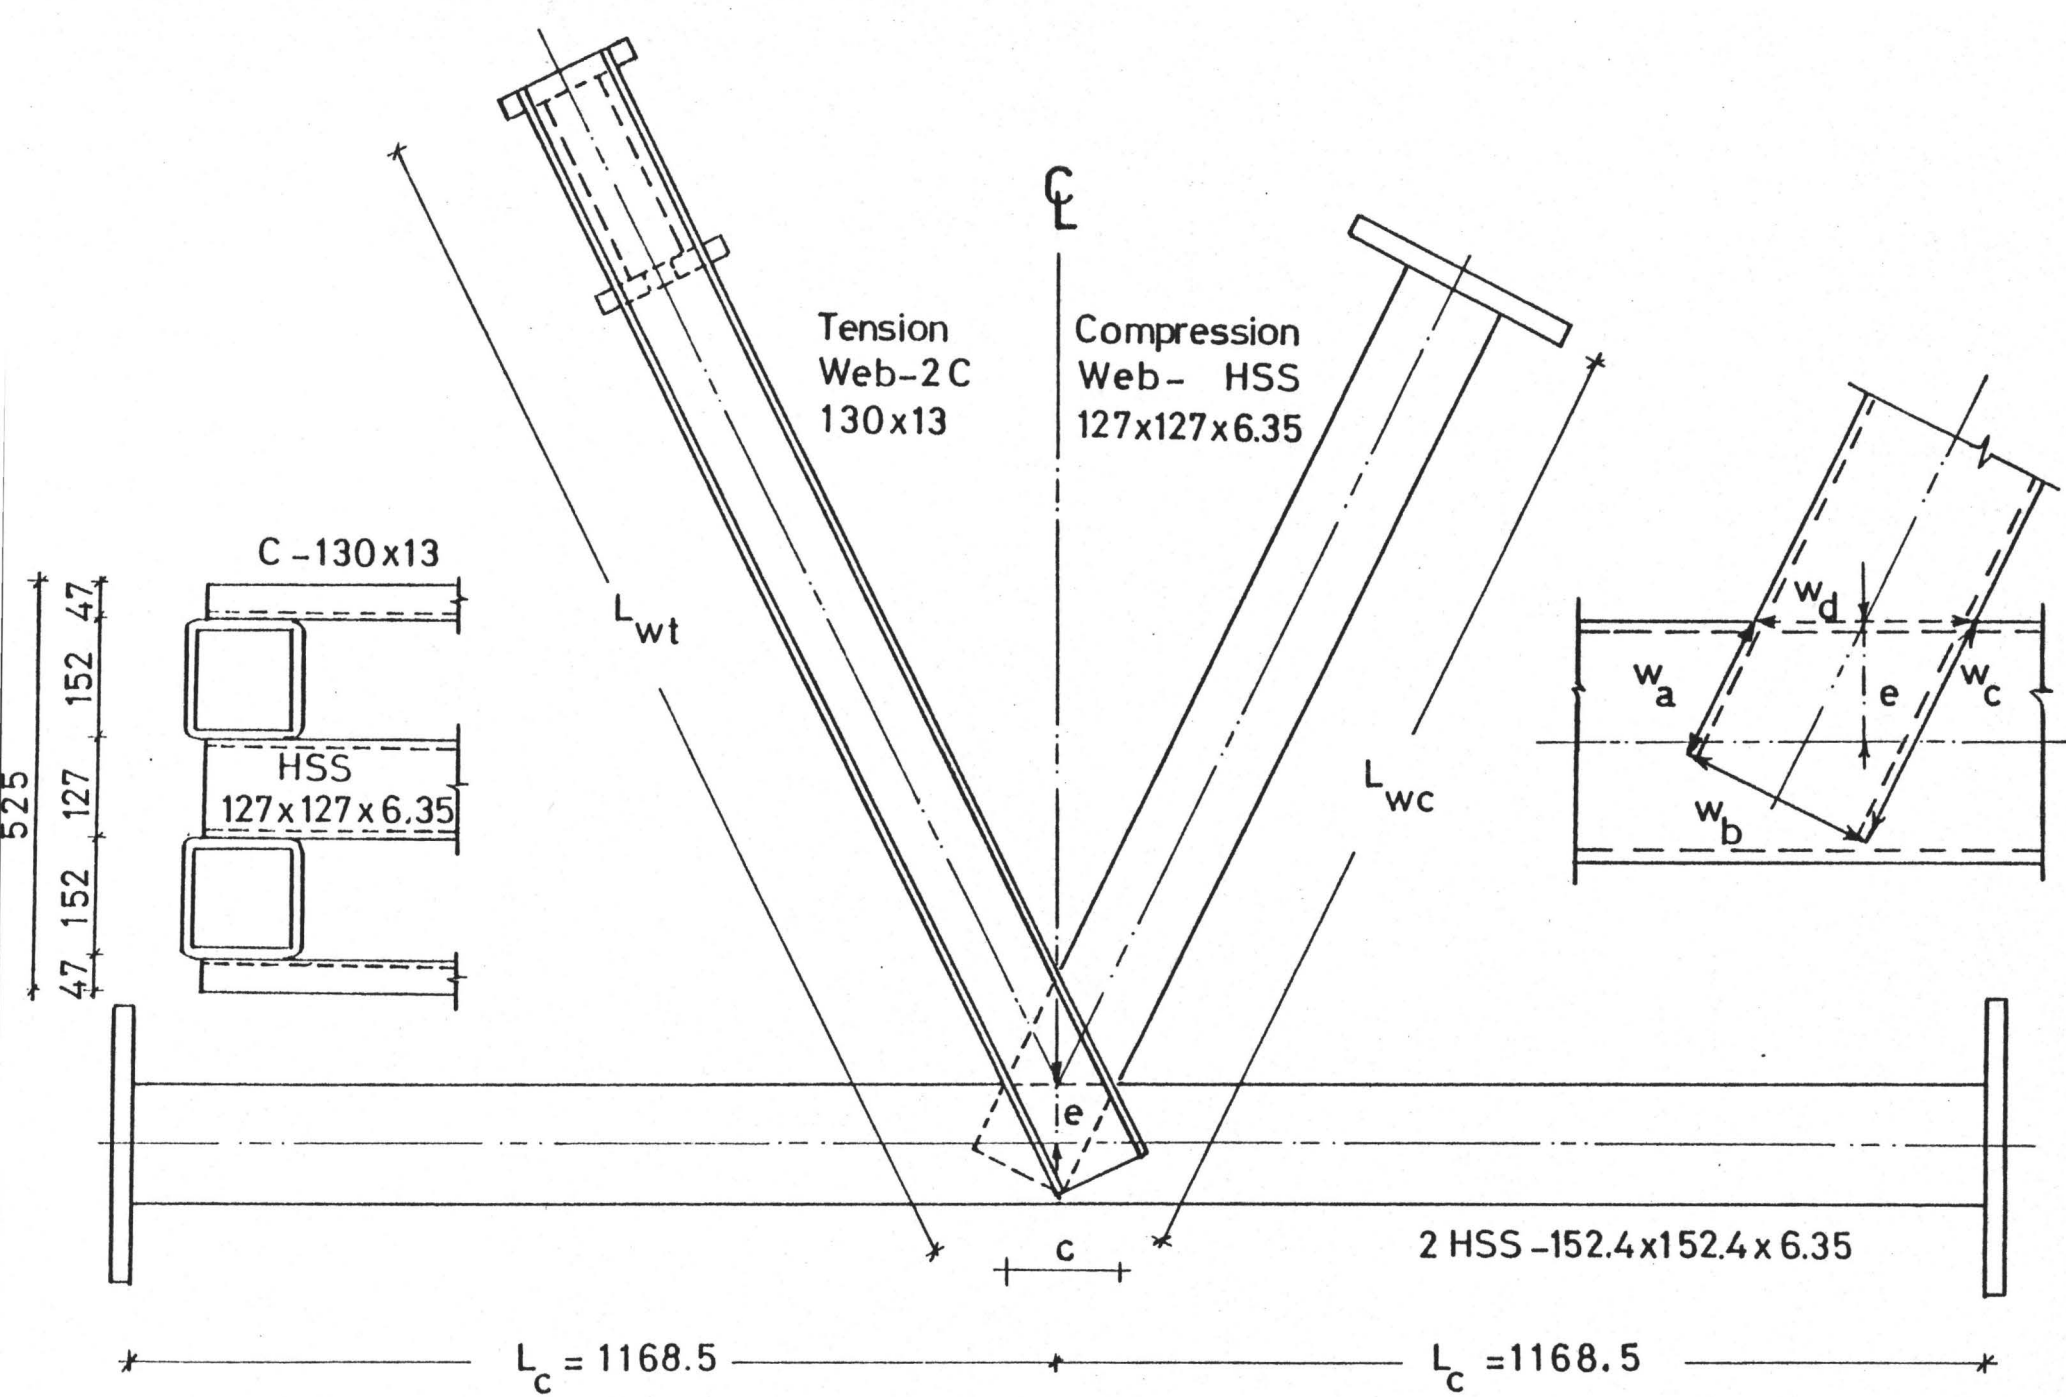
CHANNEL TYPE JOINT (Dimension in mm)
